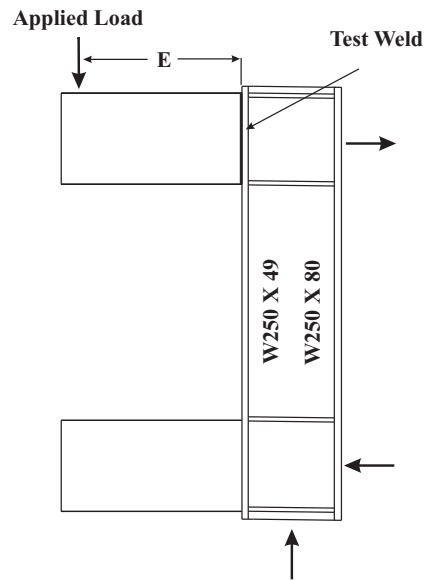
Typical test specimen used in Beaulieu and Picard (1985) test program
